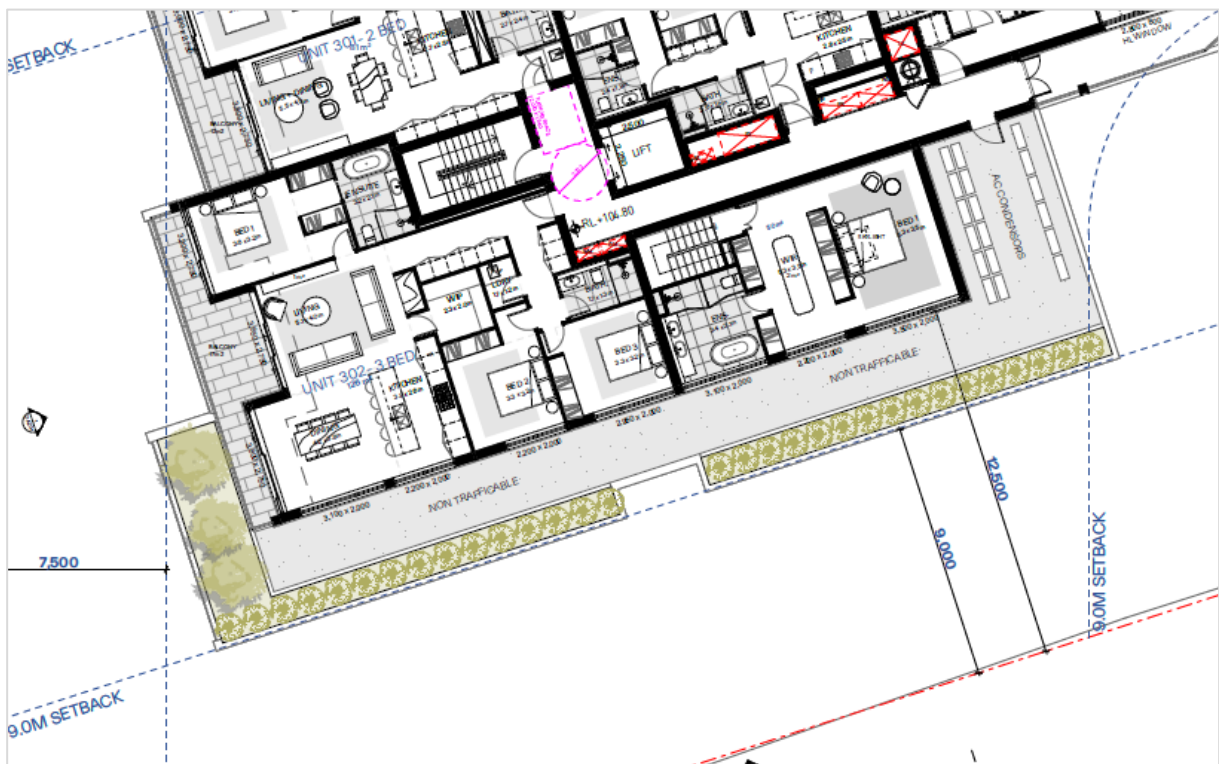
DA35/2024 Approved Plan - Level 3 Floor Plan (Units 205 and 302)
